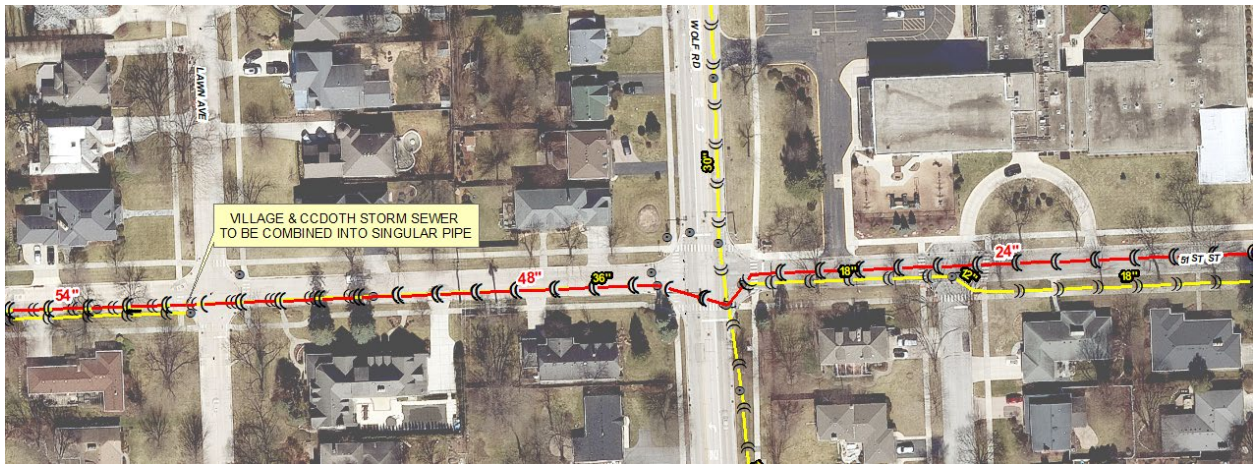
New Storm Sewer and Combining of Village & CCDOTH Storm Sewer on 51st Street
